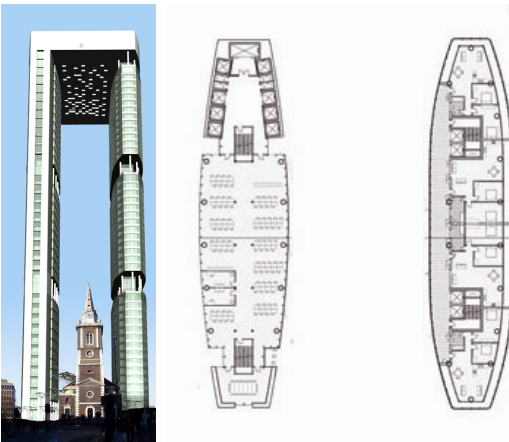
“Building as Frame”: (a) Image, (b) Typical Plan
